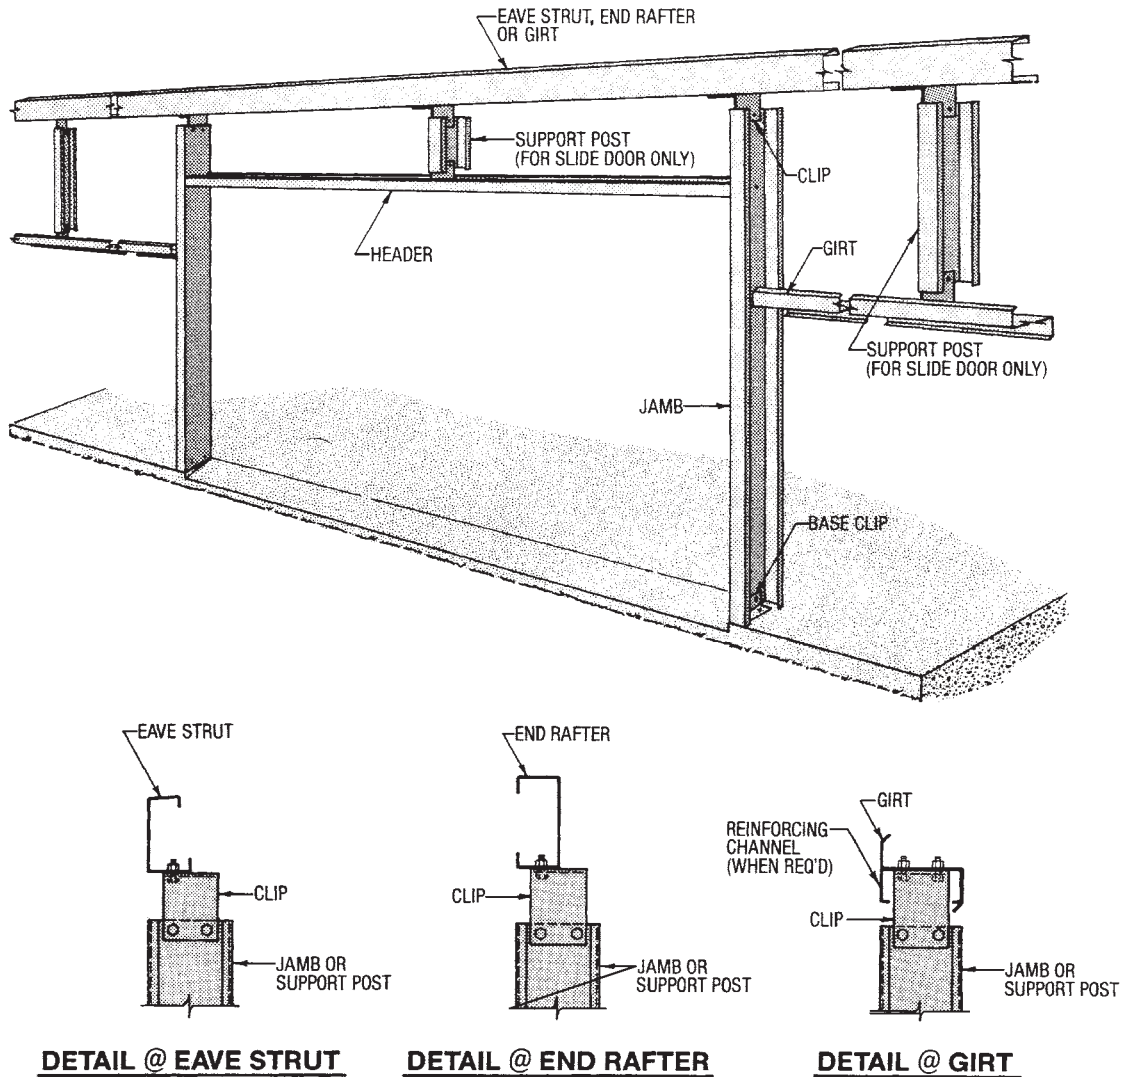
Typical framed opening for a sliding door. (Star Building Systems.)
